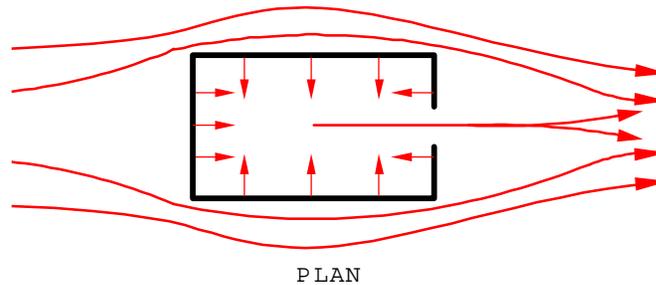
Internal Pressures Caused by Leeward Wall Openings
